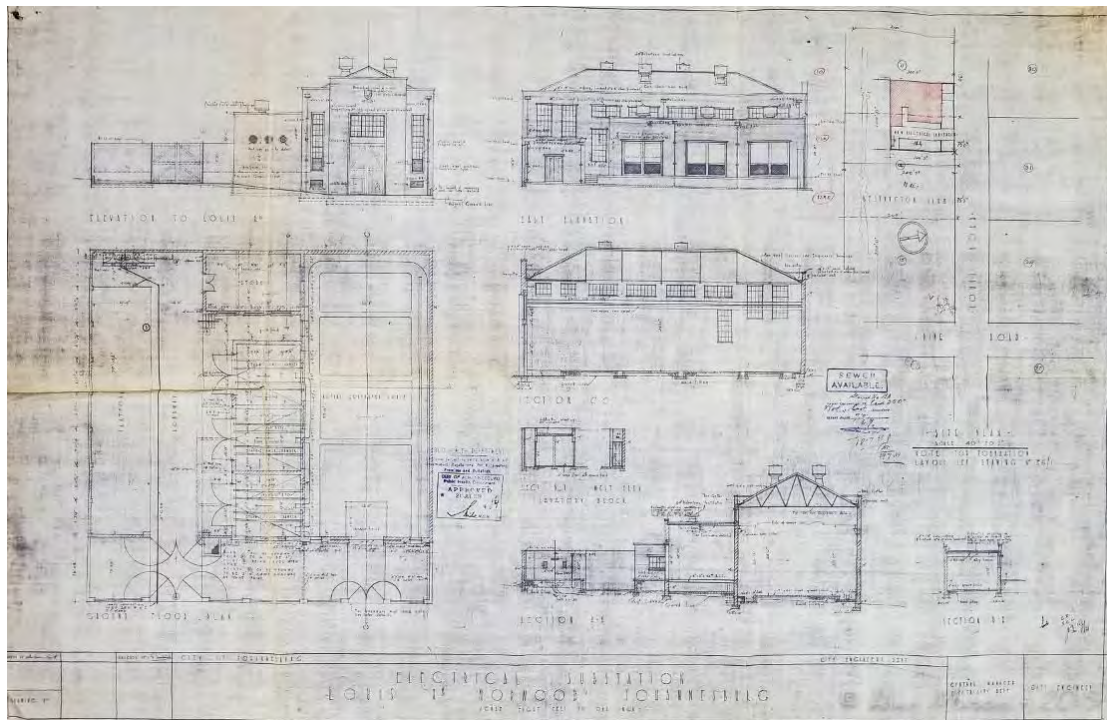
Plan for proposed Electrical Substation along Louis Road, Norwood
